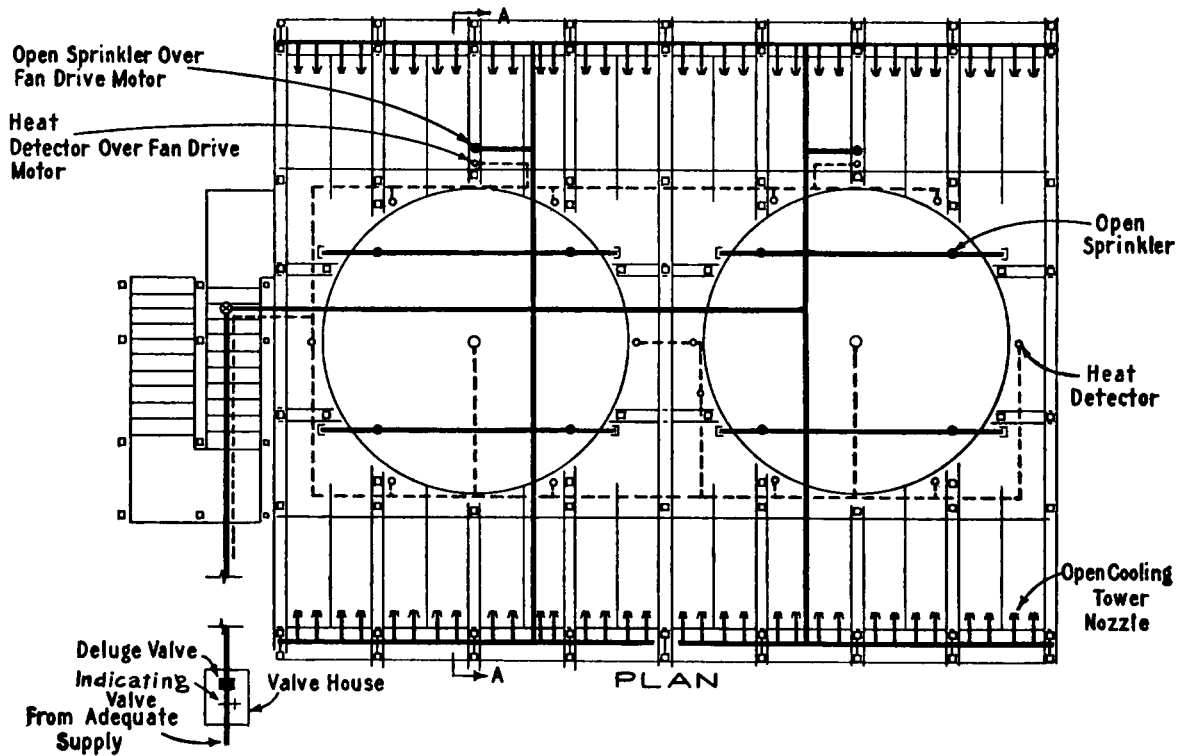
Typical deluge fire protection arrangement for crossflow towers. (See Note following caption of Figure B-12.)
